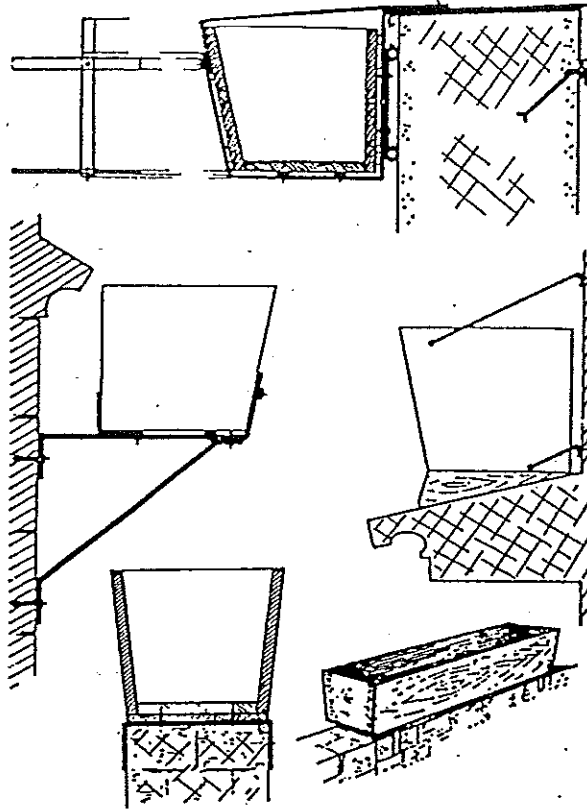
Methods of fastening a window box securely. Top. In front of a stone railing. Center left. To house wall, below narrow sill. Center right. On slanting window sill. Bottom. On top of stone wall.
